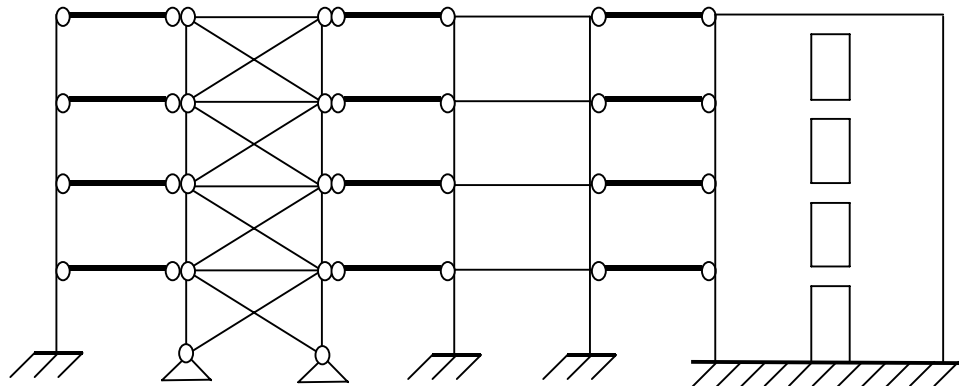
Combination of a core, braced frame, rigid frame and coupled wall.
